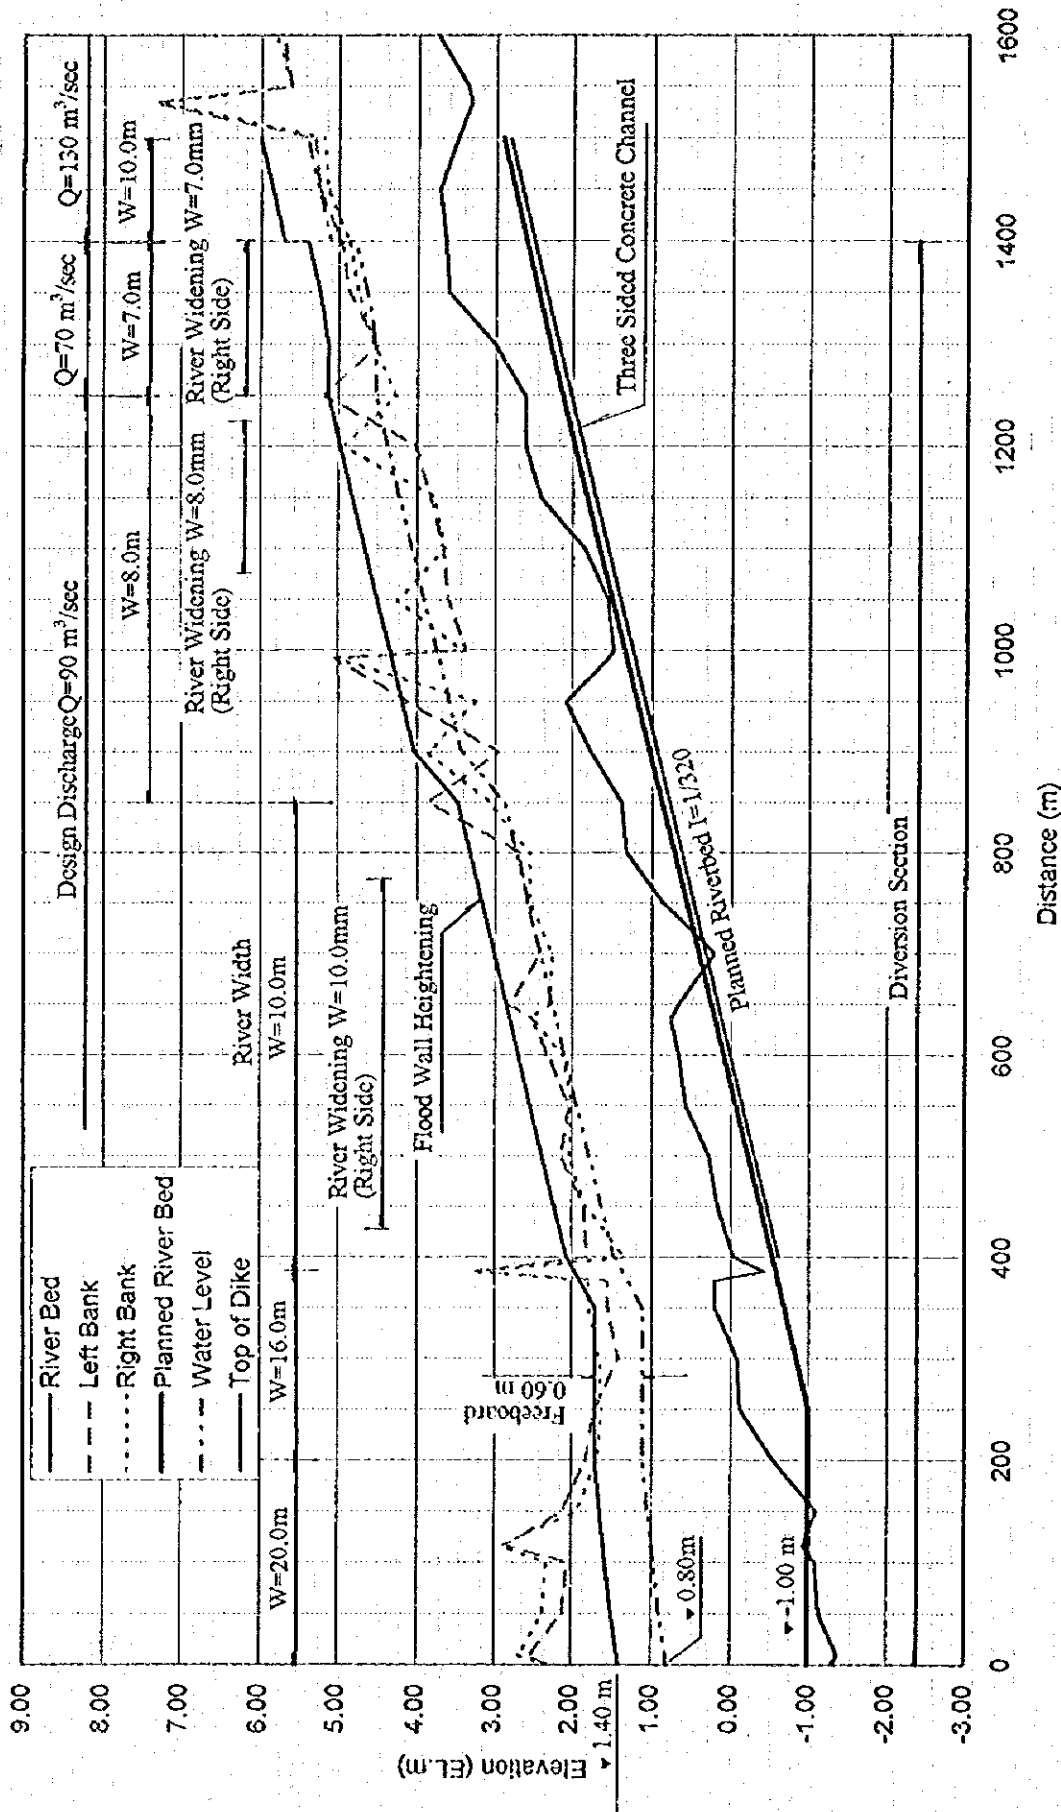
Longitudinal Section of Batu Merah River Improvement Plan
